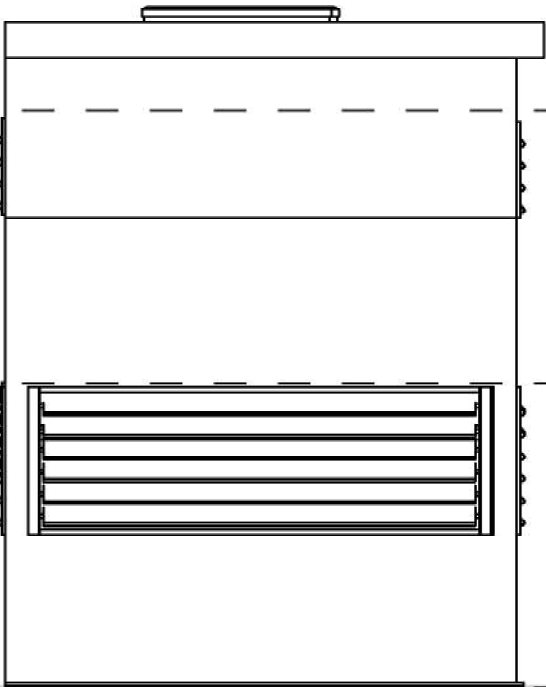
ELEVATION 2: SCALE 1/4" = 1'0"
